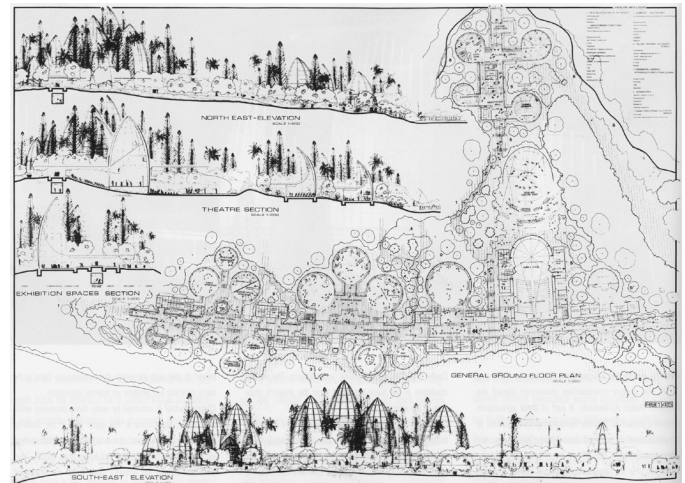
Competition entry by Renzo Piano Building Workshop. Courtesy of Renzo Piano Building Workshop.
